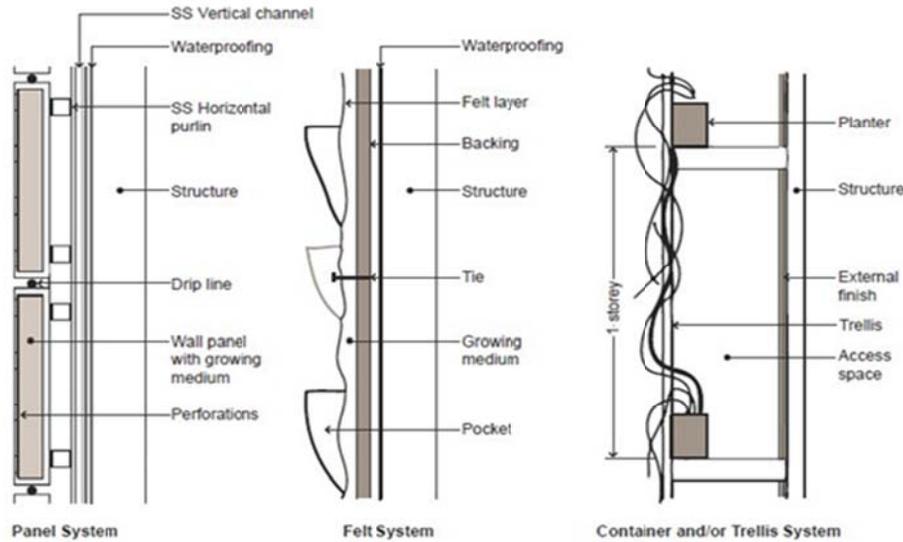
The structure of the three generic living wall systems (Source: Loh (2008), Drawing by M. Murray)
